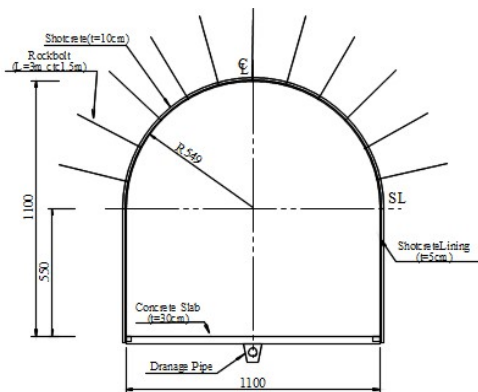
Cross sectional drawing of access tunnel to experimentation hall
